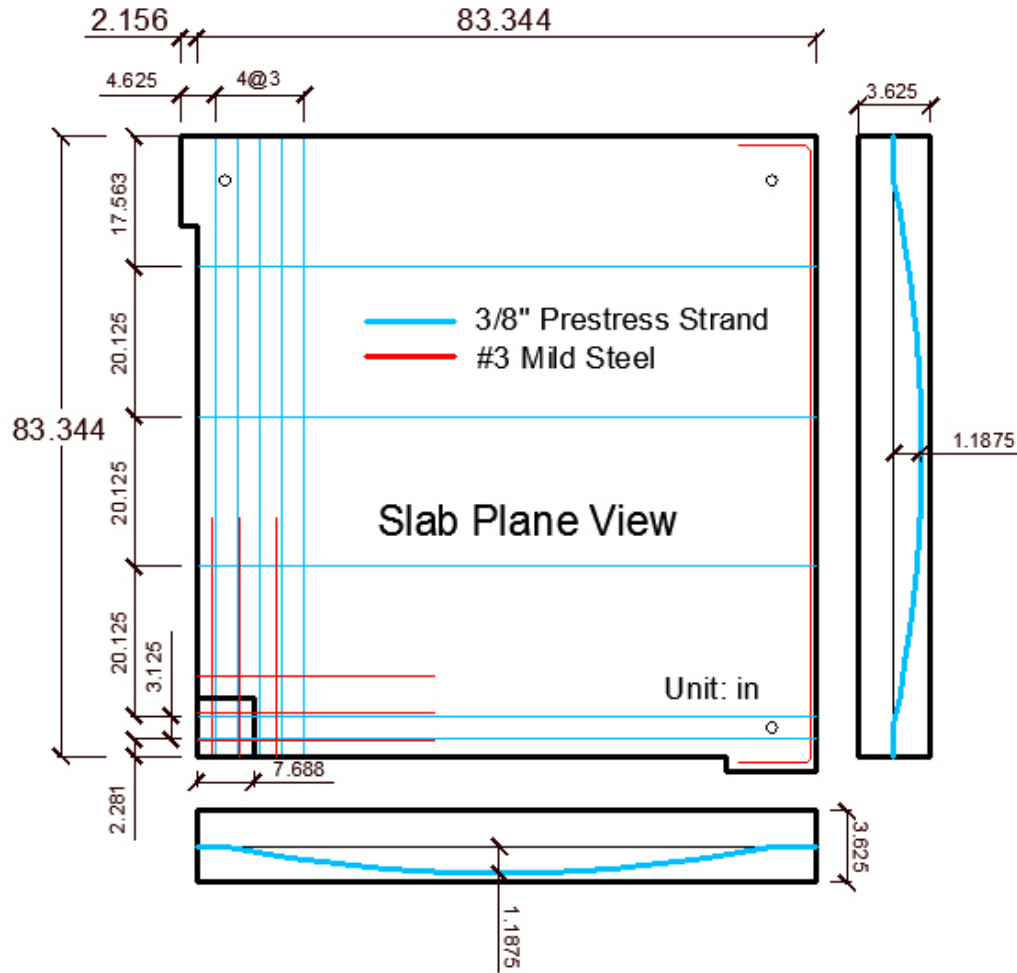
Details of reinforcement and dimensions of Specimens C1 and C2
